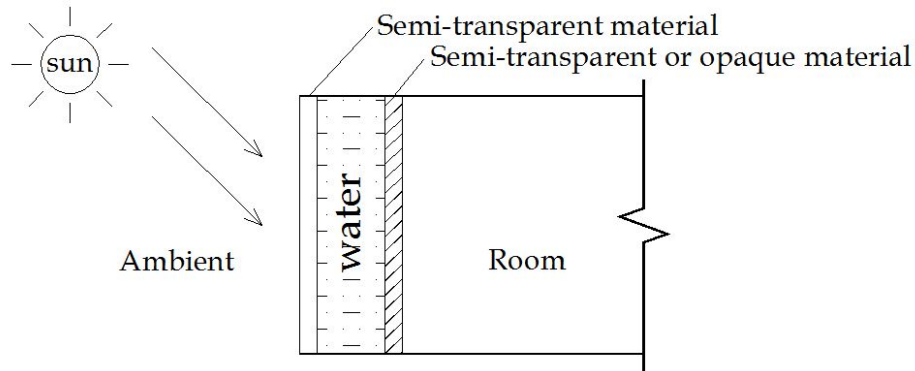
Sketch of a water wall with a semi-transparent building envelope.
